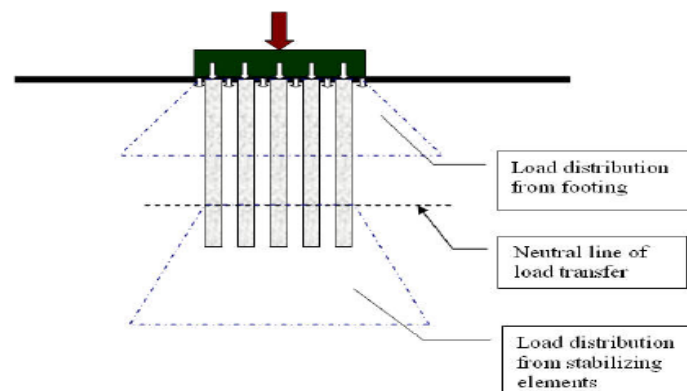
Concept of load sharing between foundation footing and settlement-reducing elements, (Massarsh,1997)
